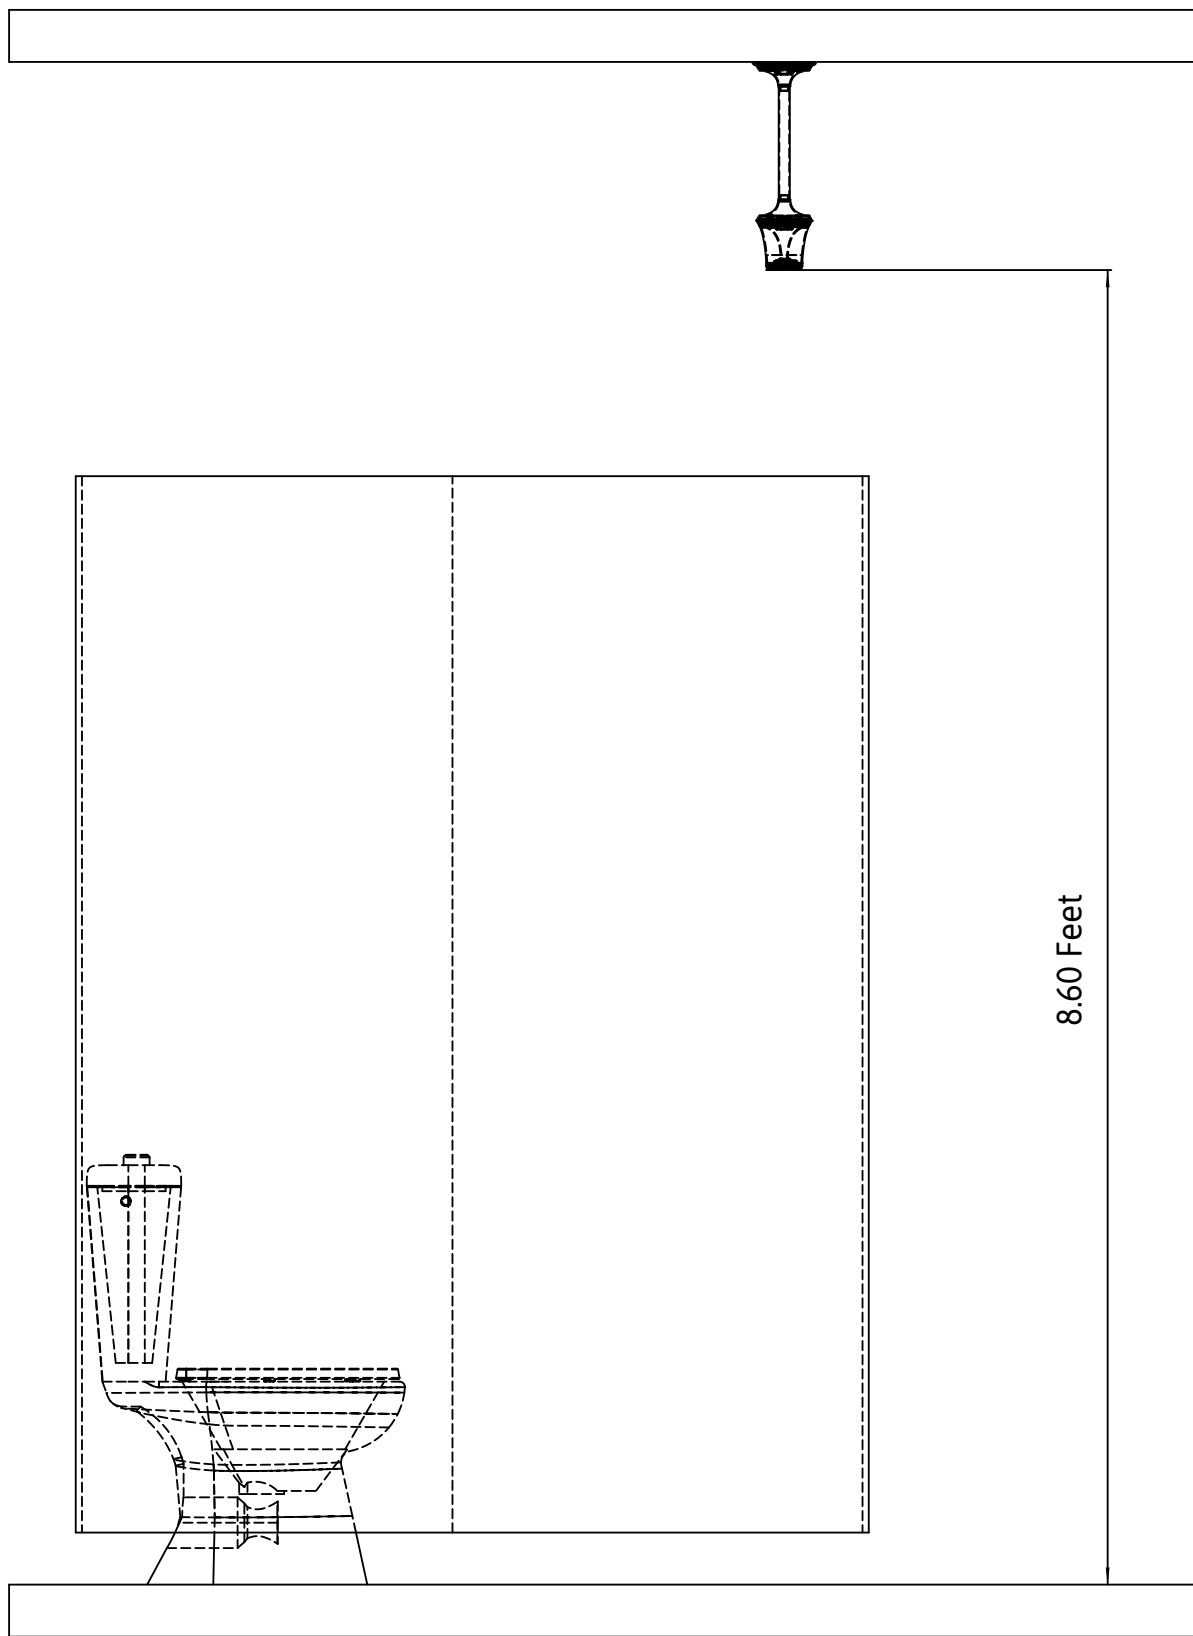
INSTALLED CEILING MOUNT (STEP 2)
